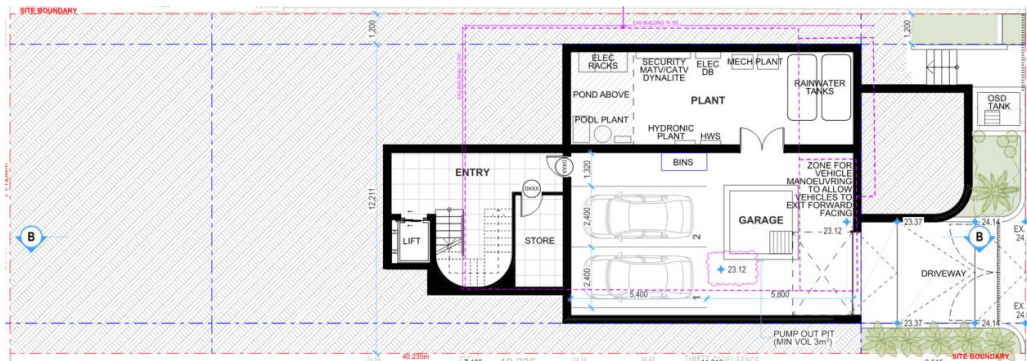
Proposed basement floor plan - 61 The Corso, Maroubra (Source: PopovBass)
